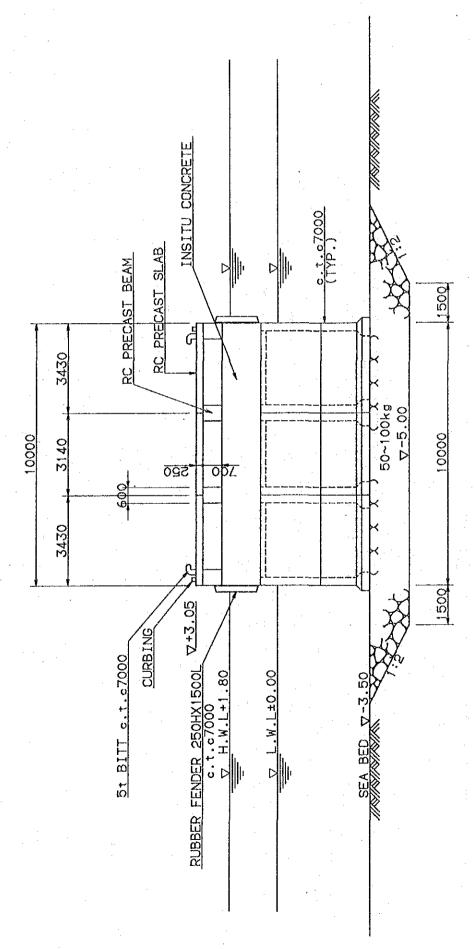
Lay-by Jetty (2) Typical Section
